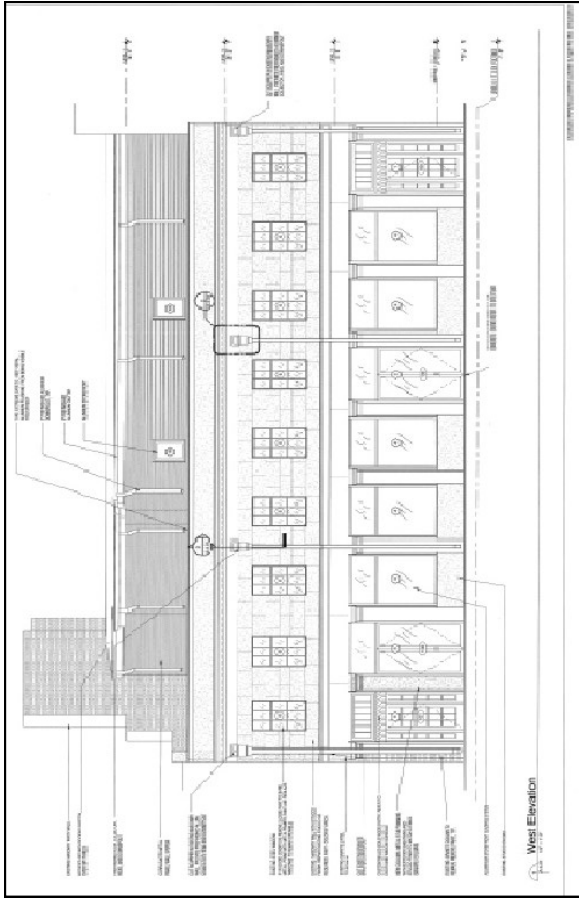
EXHIBIT A: EXAMPLE SITE PLAN #2 - ARCHITECTURAL PAGES
